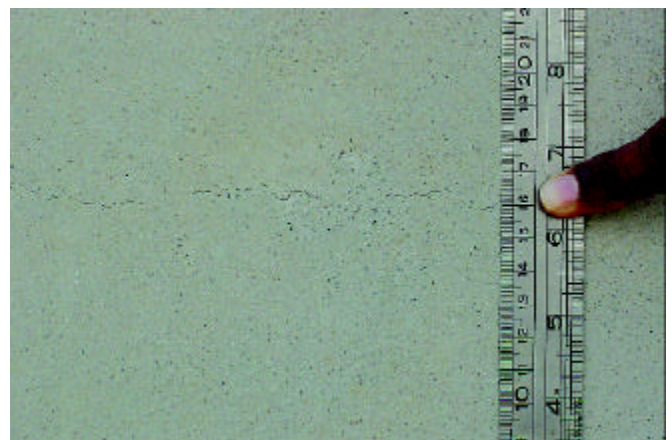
Example of crack that can be filled and “heal” from a delayed smoothing with a mechanical finishing machine.
